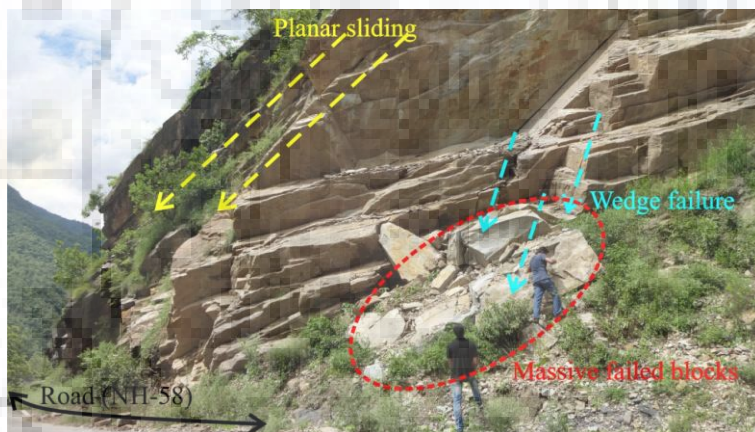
Field photograph depicting massive failed blocks and a potential site for planar and wedge sliding at slope S13
